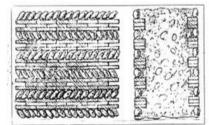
A profile of Sasanid bridge structure, which was used in constructing Dezful watermills in Dezful Source: author
